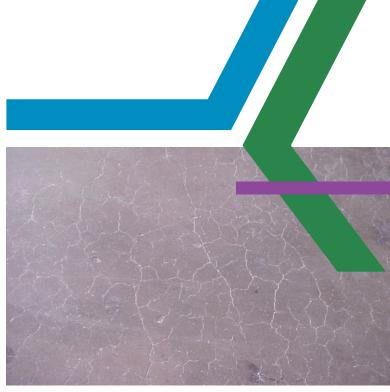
"Map Cracking," a type of plastic shrinkage cracking
